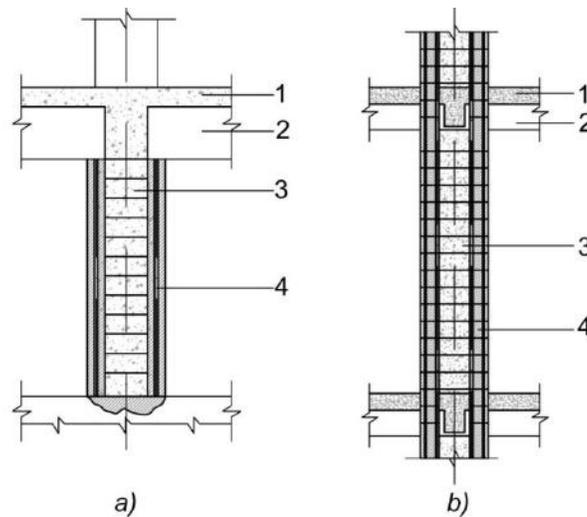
Types of RC column jackets: a) story level (discontinuous) jackets for enhancing the shear resistance, axial resistance and confinement, and b) continuous jacketing for enhancing the flexural resistance: 1- existing RC slab; 2- existing RC beam; 3- existing RC column; 4- new RC jacket (based on UNIDO, 1983).
